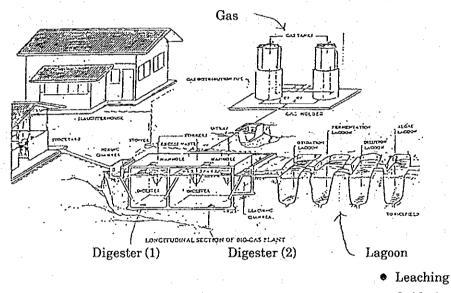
Longitudinal Section of Bio-Gas Plant
